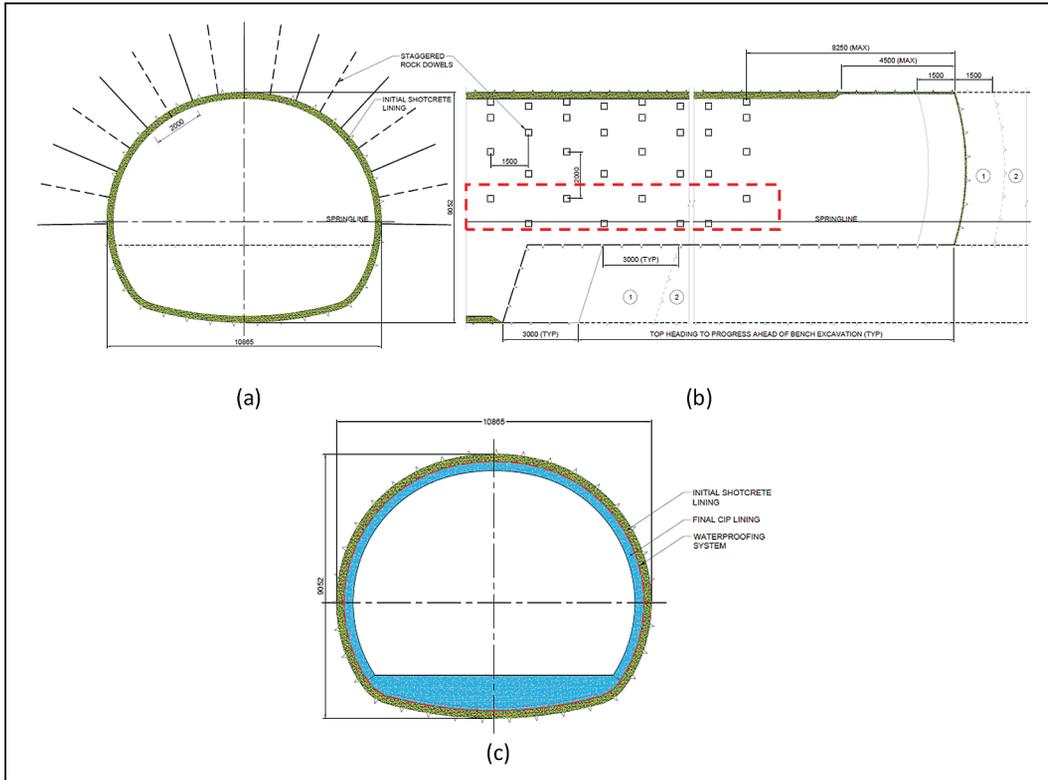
Typical tunnel geometry: (a) primary lining, (b) typical excavated sequence with rock dowels, and (c) secondary lining
